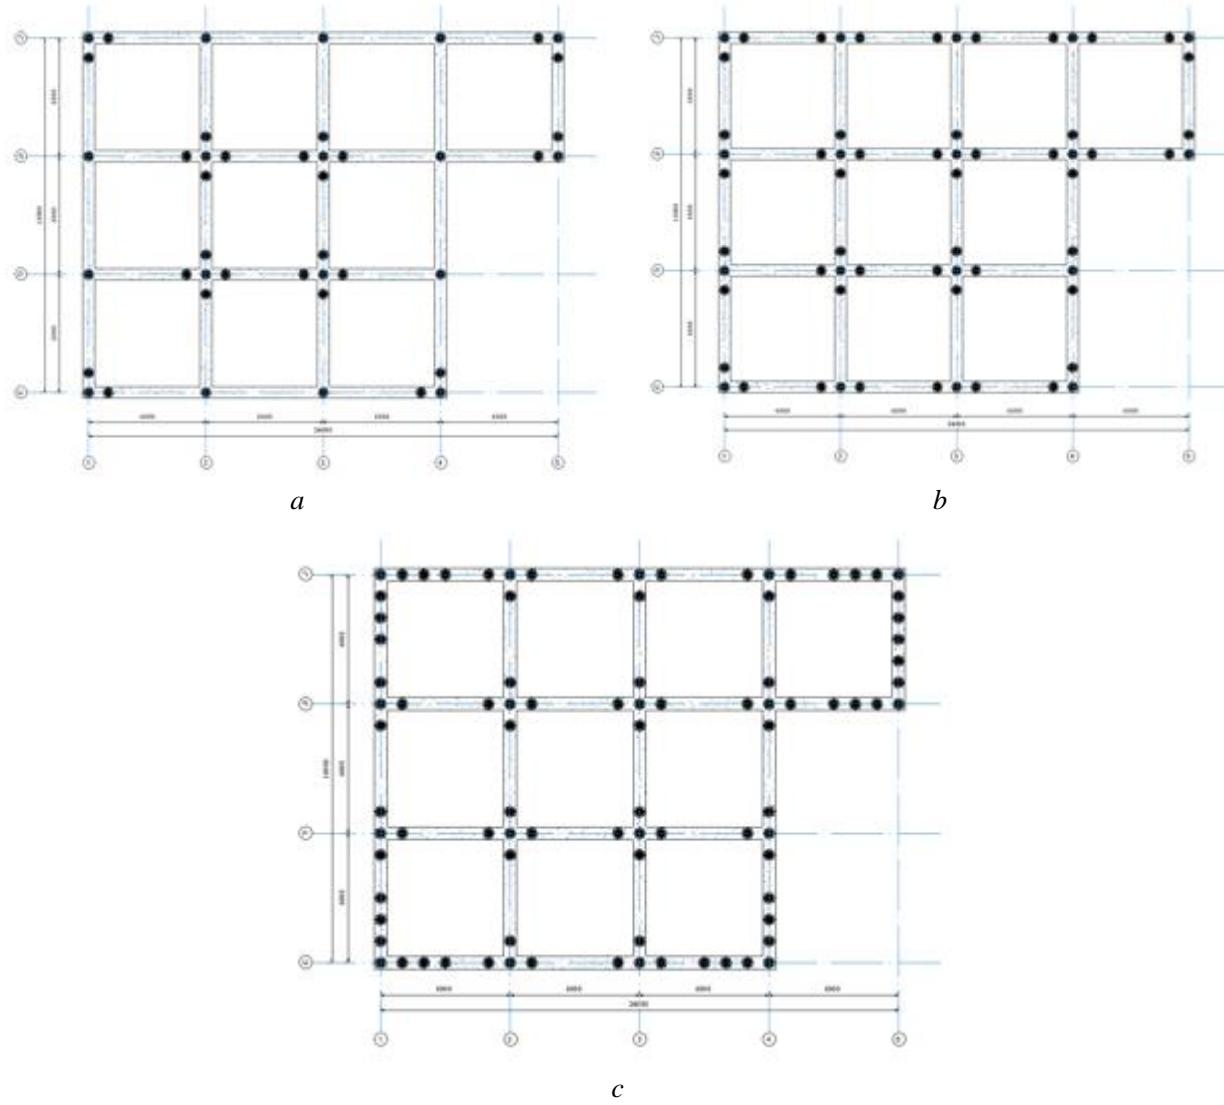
RMLSIS layout planning of five-story (a), seven-story (b) and nine-story (c) buildings
